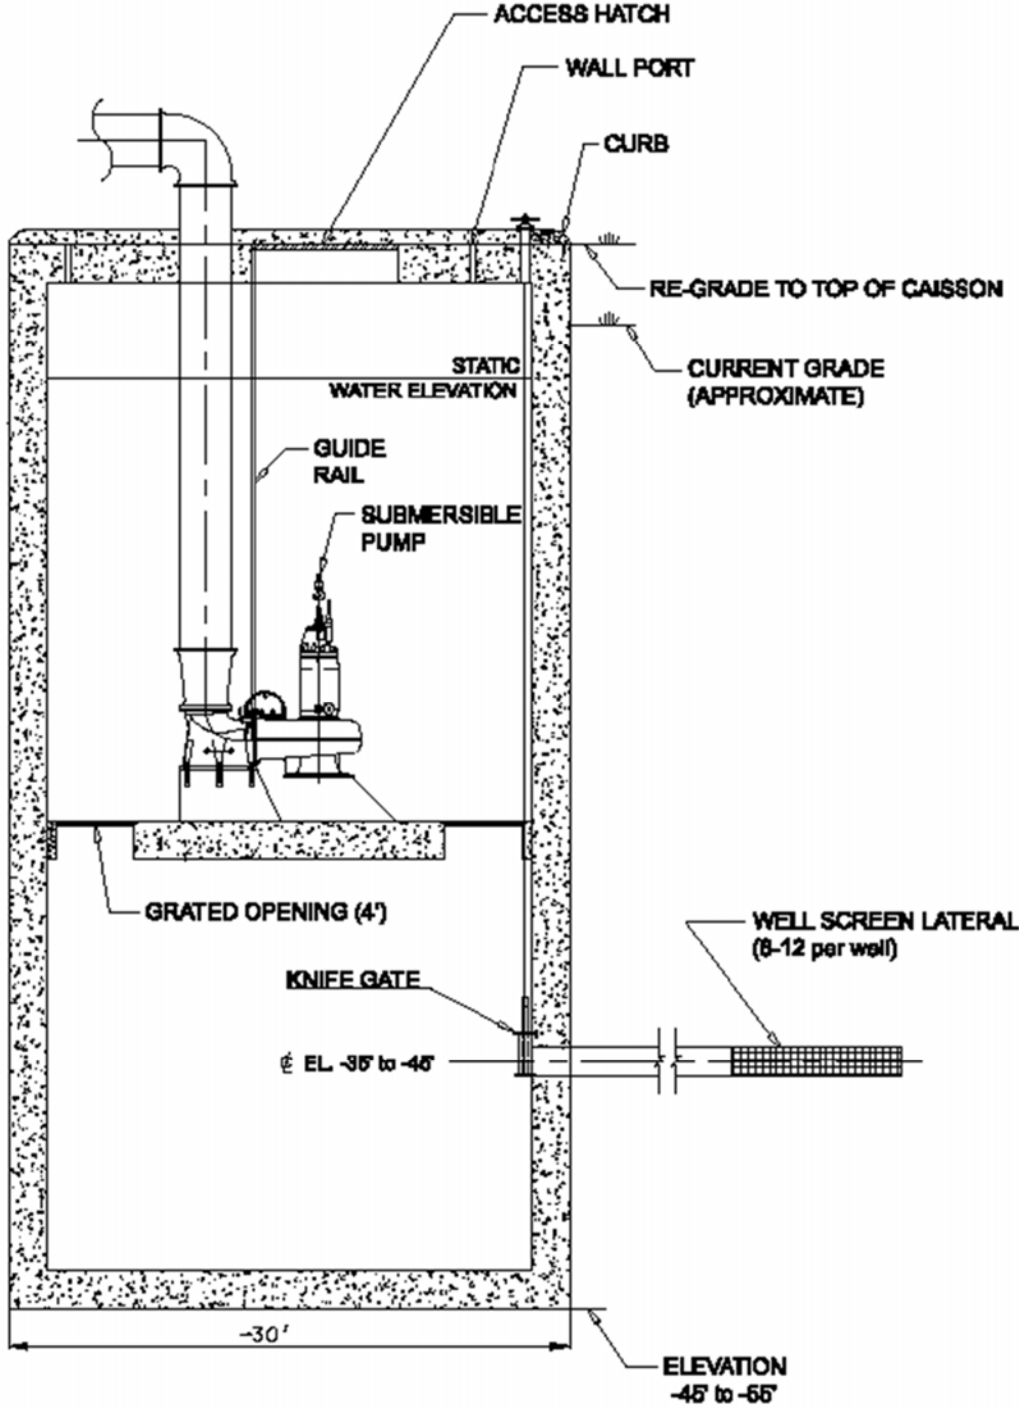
Cross-Section View of a Typical Radial Collector Well System (FPL 2014-TN4058)
